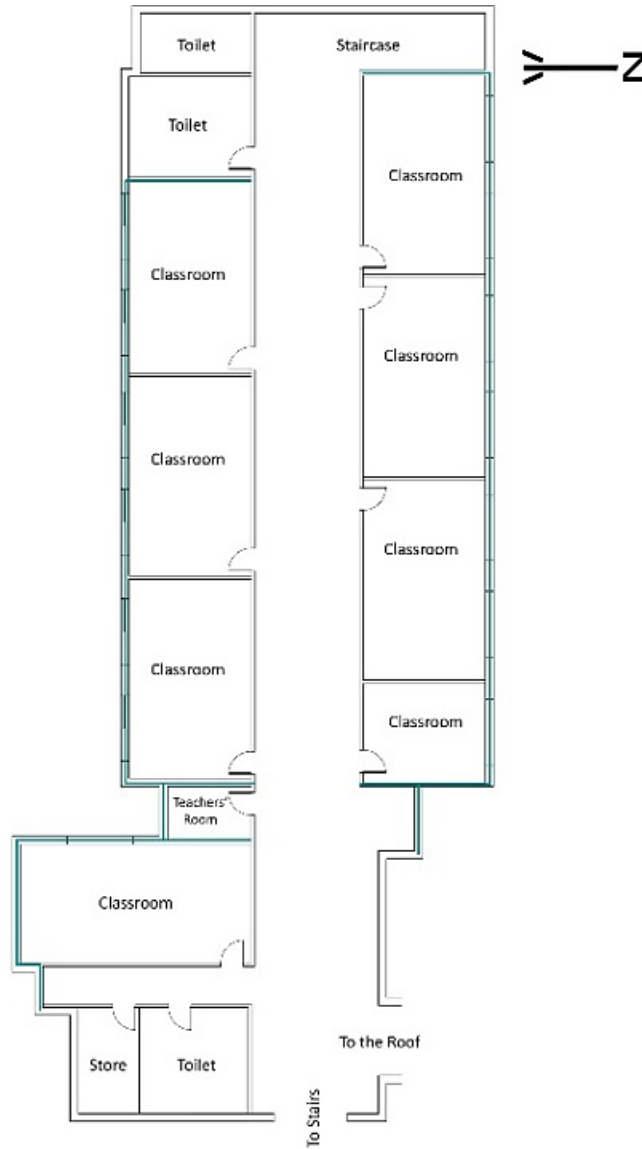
Second floor plan of the school (N.T.S.). Blue (thick) lines indicate walls to host 5cm XPS insulation, CMU, and finish layers
